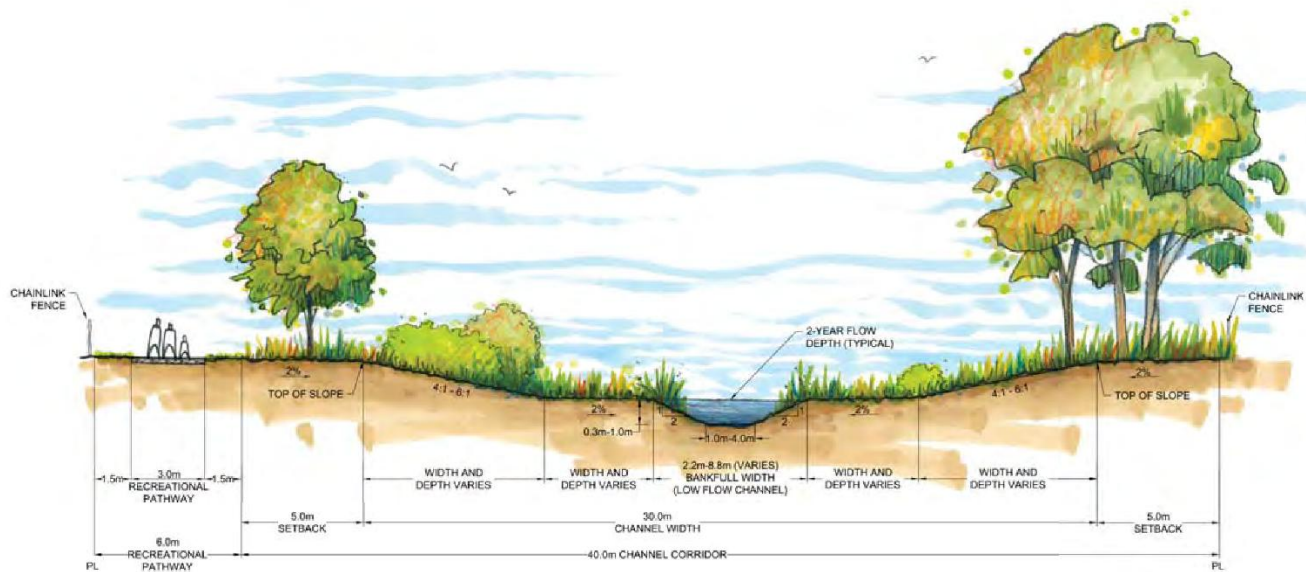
Kanata North CBD Typical Cross-Section of Creek Corridor.
